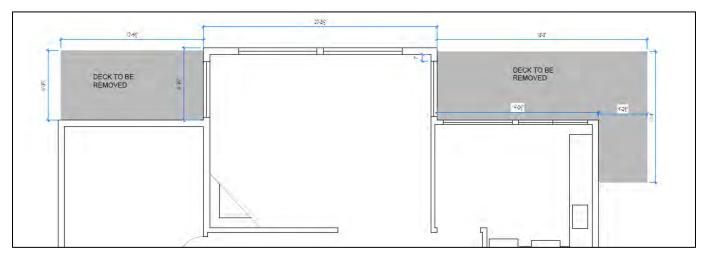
Arieal view of the proposed demolition of the existing decks. Drawings provided by Momentum Design Build.
